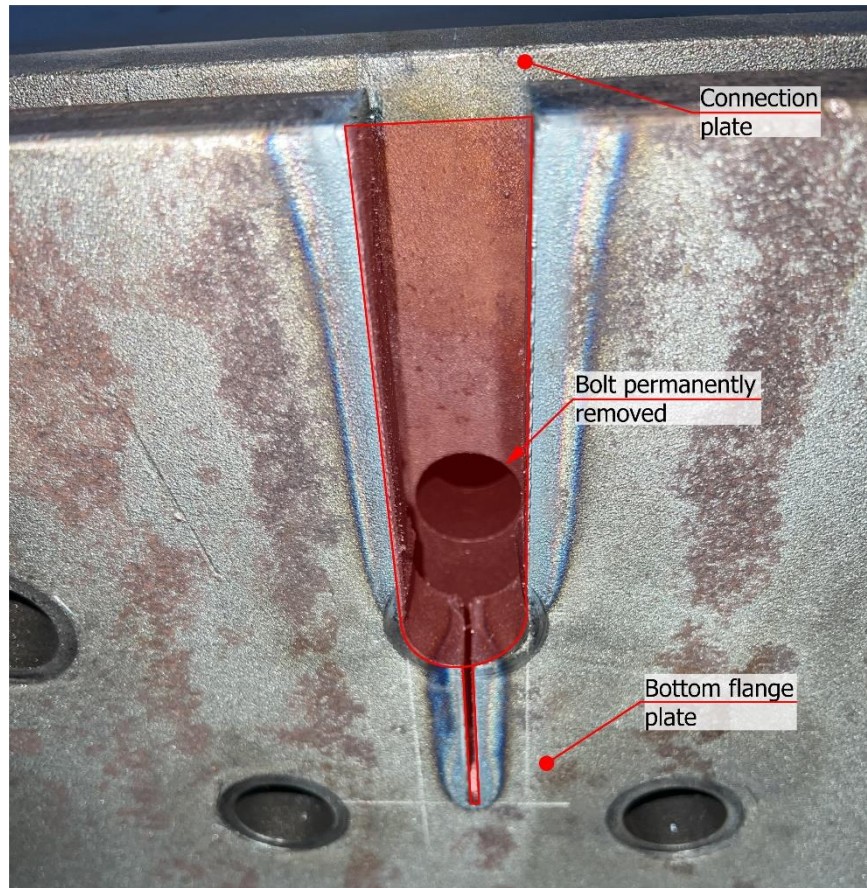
Specimen B2: initial notch on the West bottom flange plate
